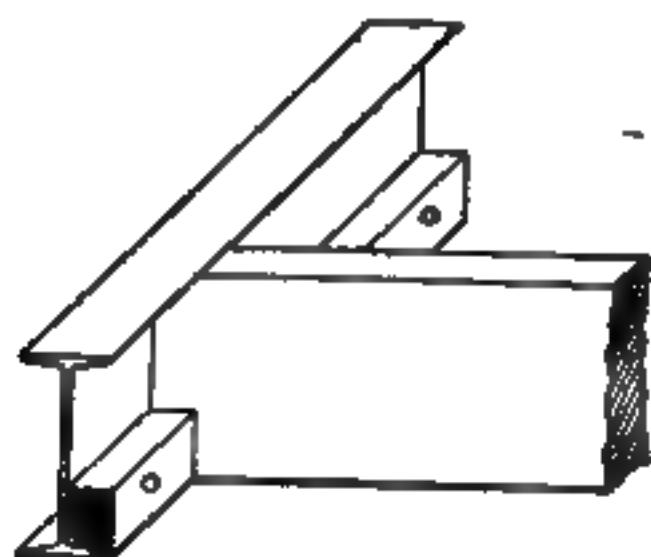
Wooden Beam Framed to I Beam with Wooden Cleat
